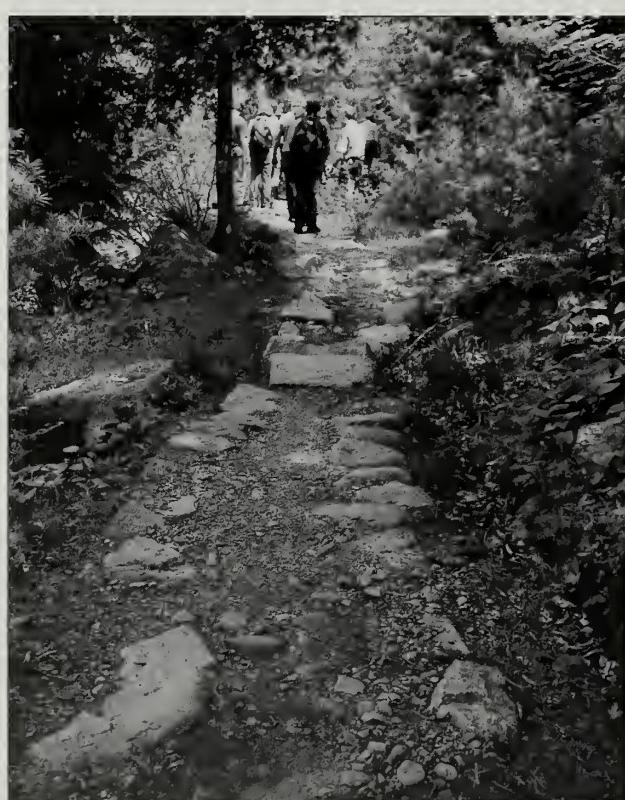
Eroded (not original) walled causeway on east side of pond.
